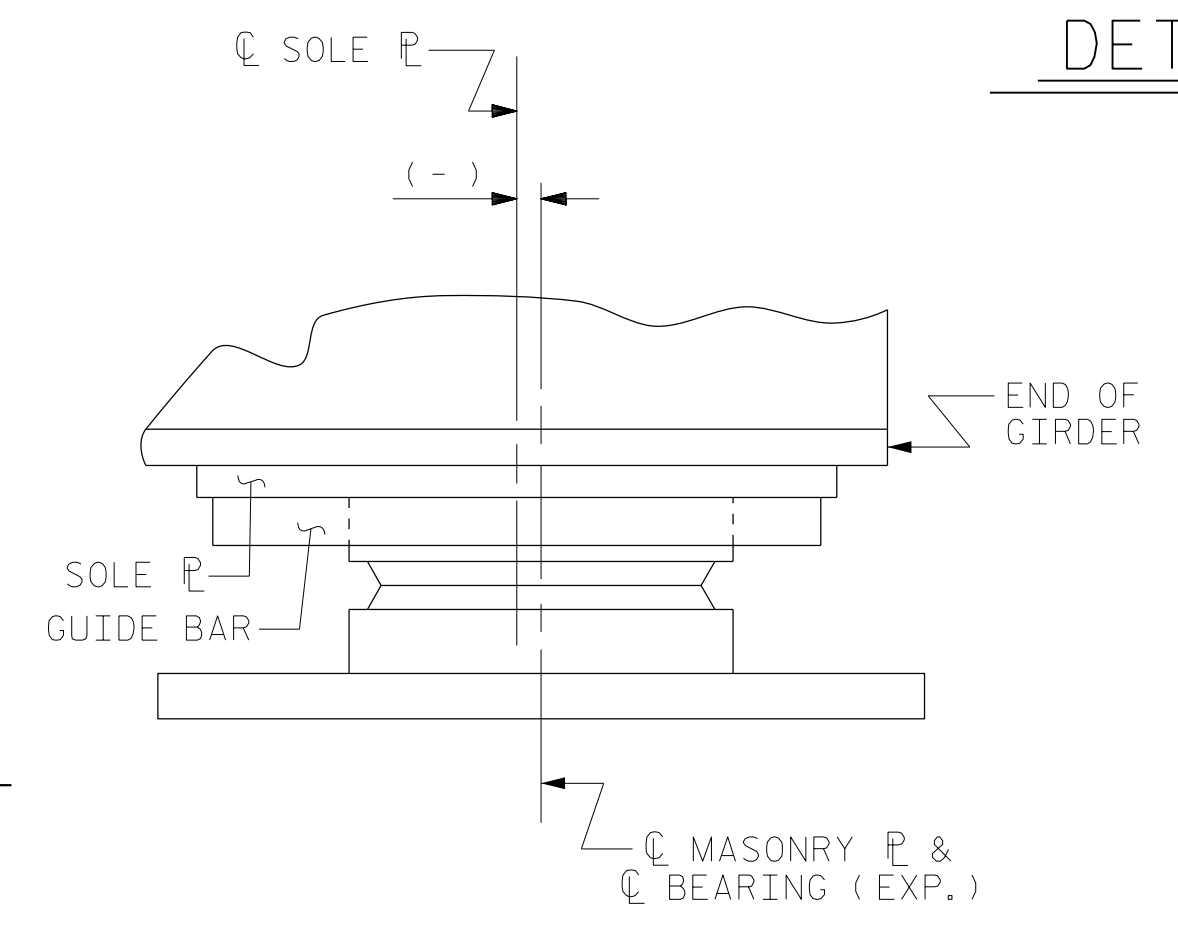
PLATE SETTING DATA (EXPANSION DISC BEARINGS)
